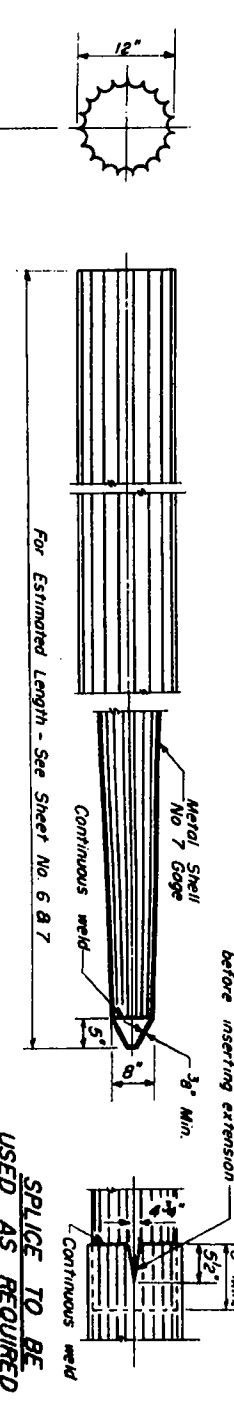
DETAIL OF CYLINDRICAL STEEL SHELL FOR CAST IN PLACE CONCRETE PILES
